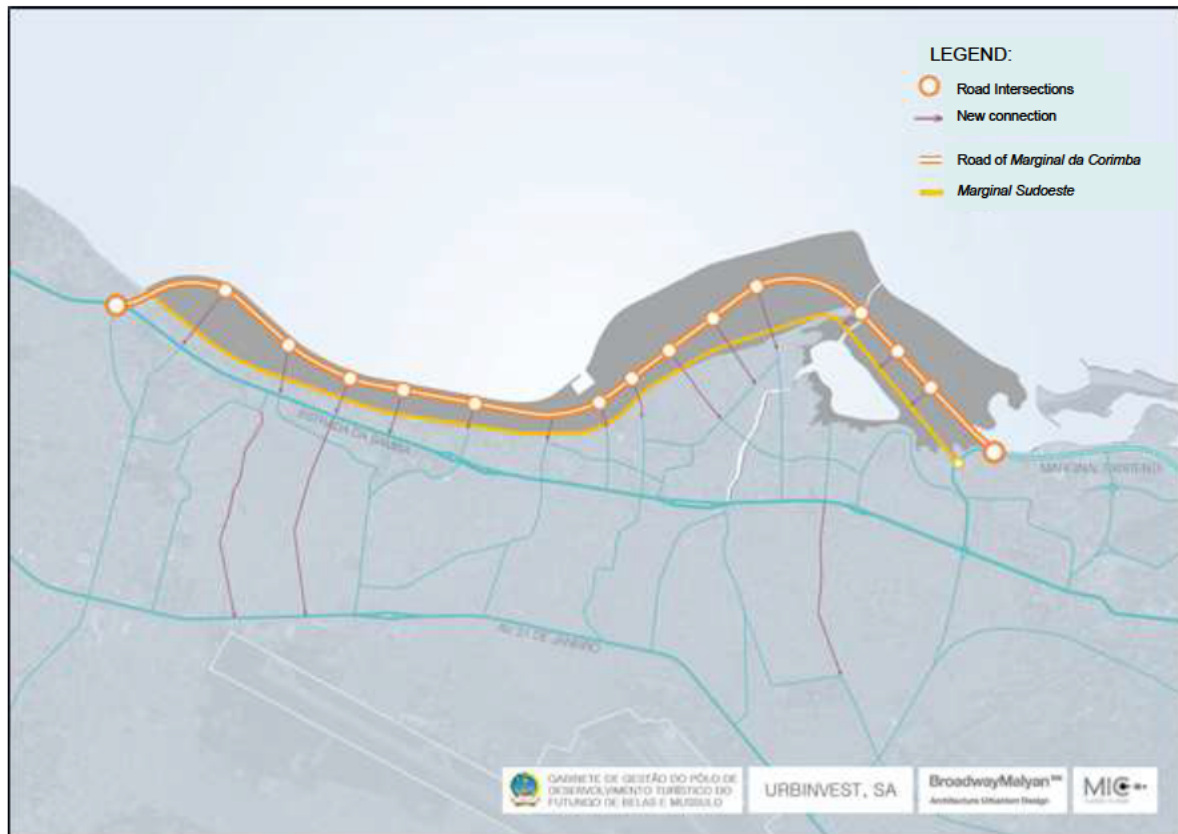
Intersections of Road of Marginal da Corimba with Marginal Sudoeste and Samba Road.
